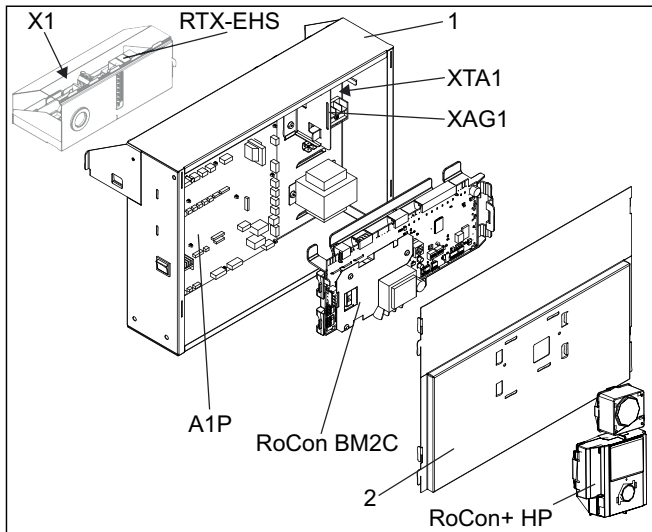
Position of the printed circuit boards and terminal strips (for the legend, see Chap. 10.5)
